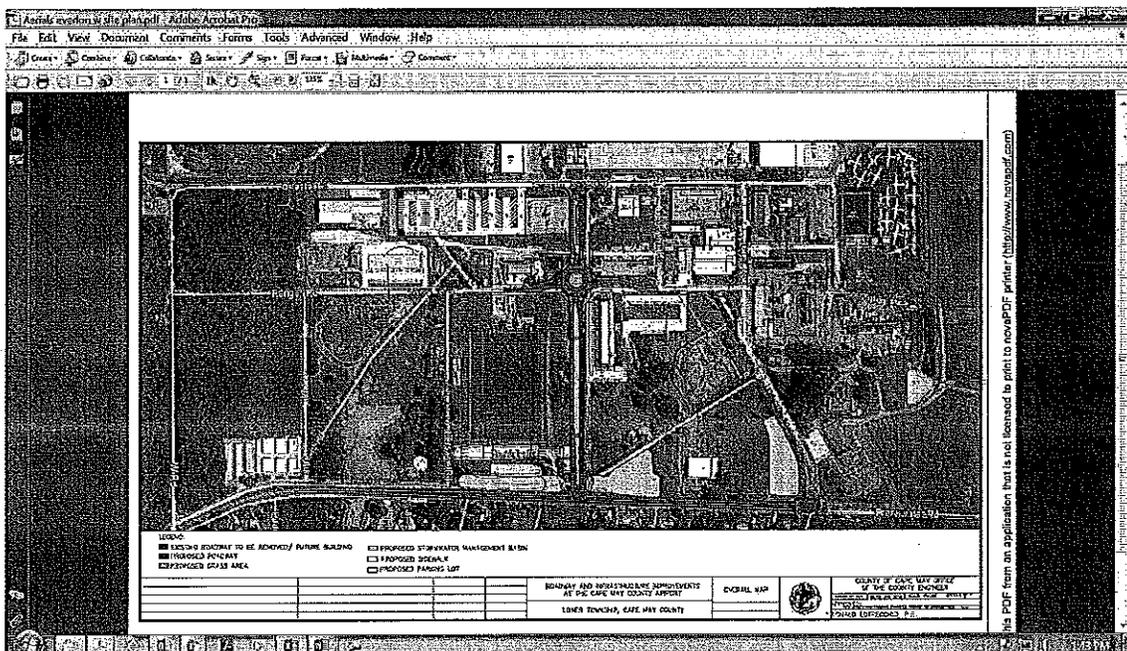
Overall Airport and Redevelopment Area Site Plan and Building Location Layout
